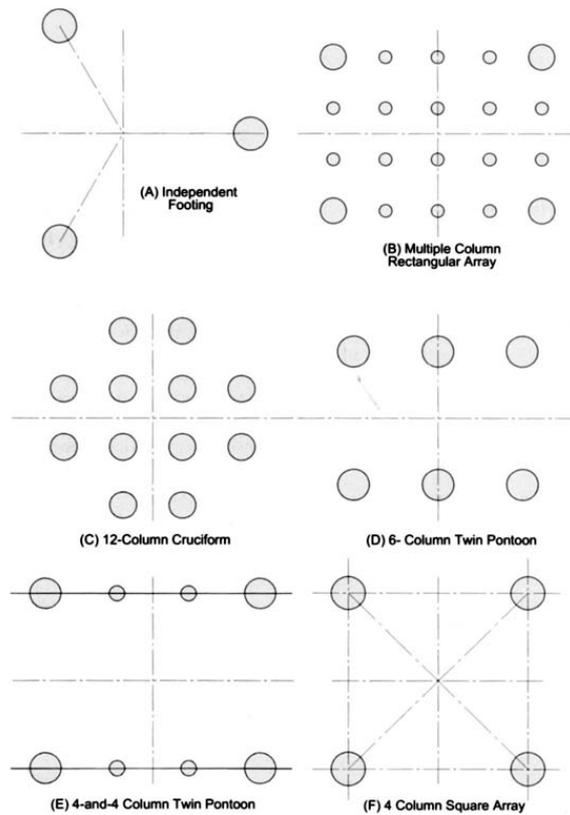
Types of semi-submersible column arrangements (Source: Chakrabarti, 2005)
